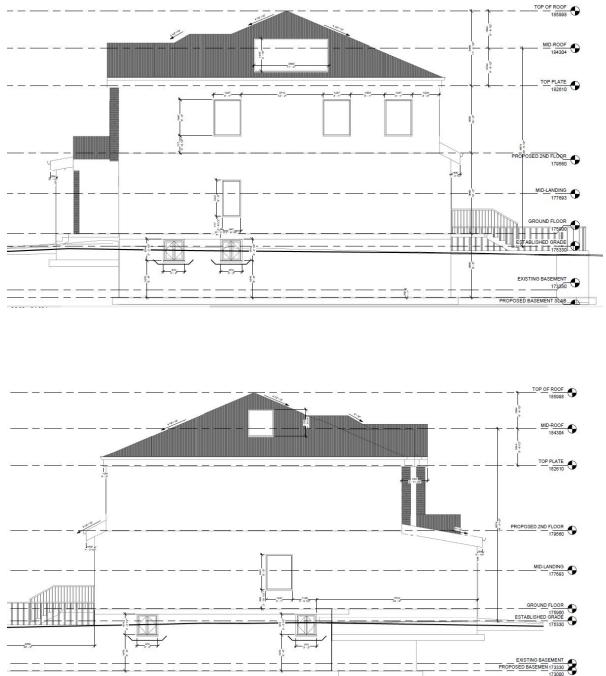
Proposed south (above) and north (below) elevations of the new dwelling.
